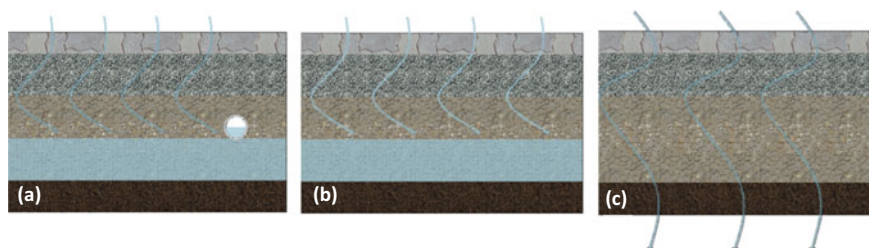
Hydraulic behaviour of permeable pavements. a Deferred drainage to the conventional system, b storage, c Infiltration into the ground
